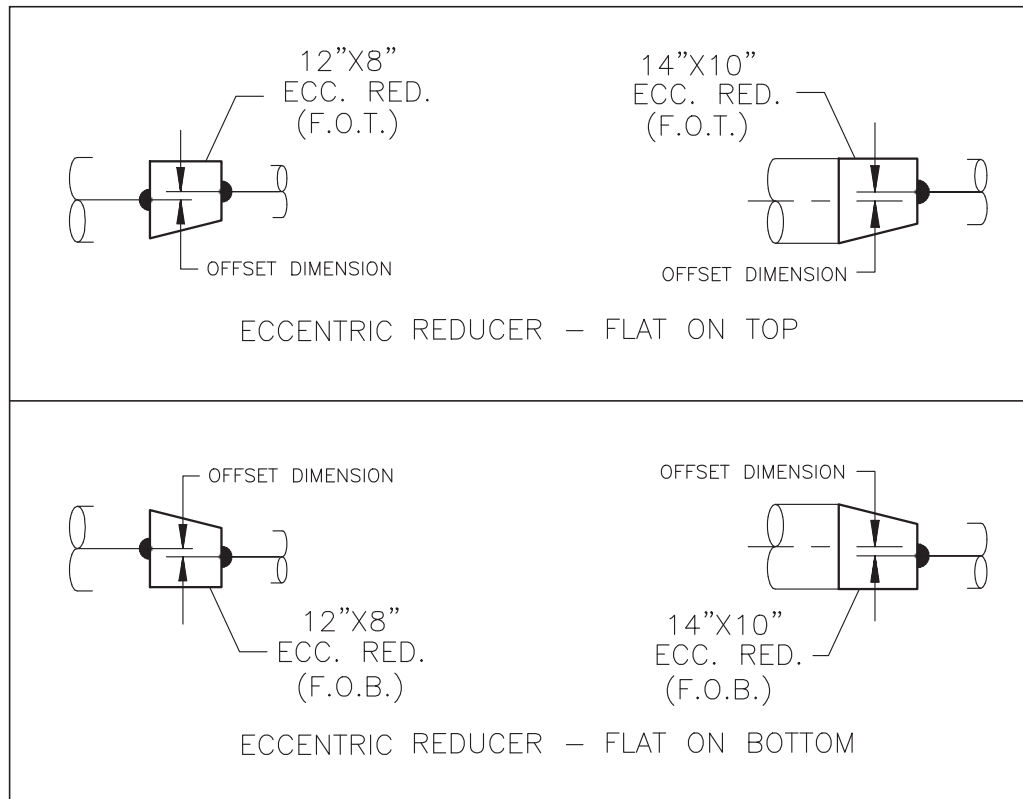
Offset dimensioning of eccentric reducers.
